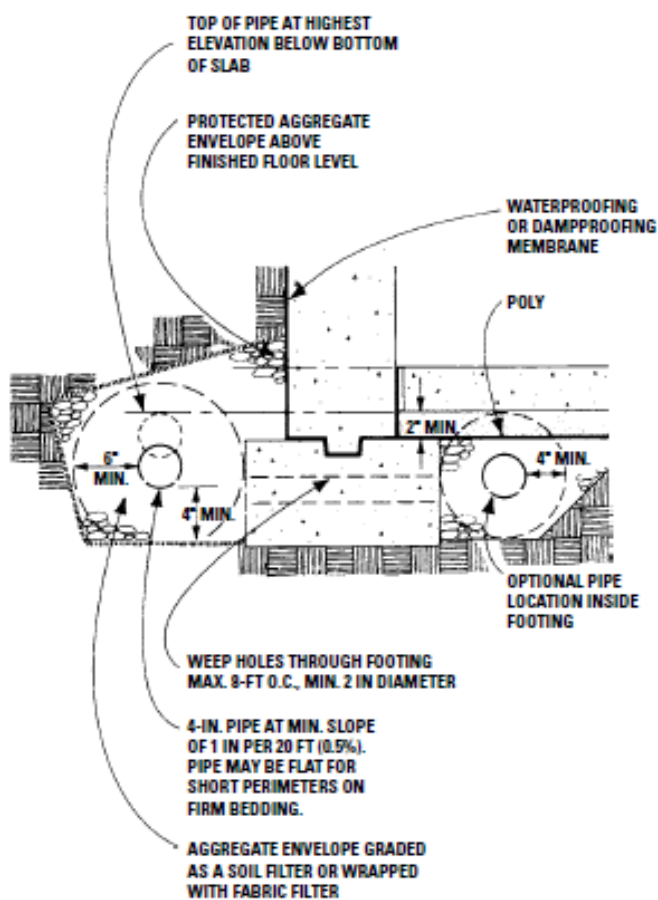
Footing with perimeter drainage. (Courtesy ORNL)
